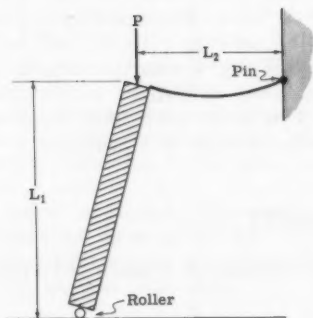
FRAME WITH ONE VERTICAL MEMBER ON ROLLERS AND HORIZONTAL MEMBER PINNED AT WALL
